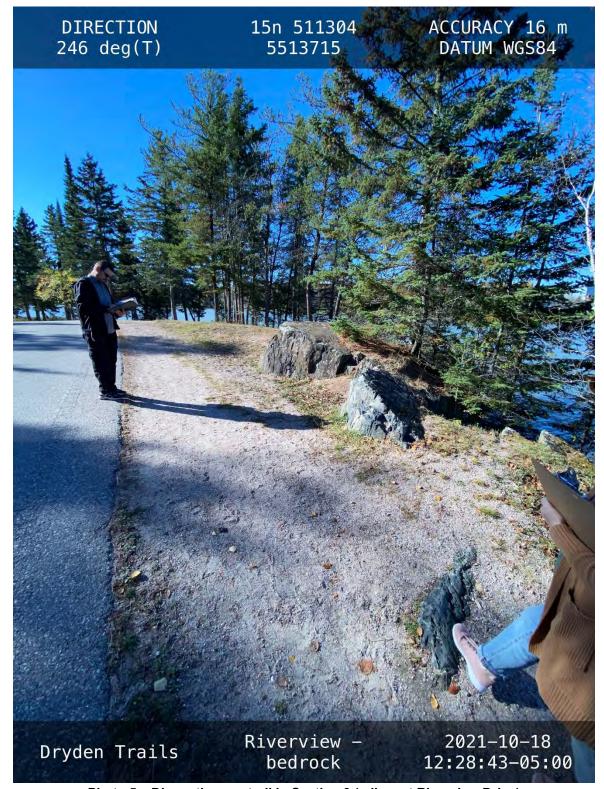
Discontinuous trail in Section 3 (adjacent Riverview Drive)
